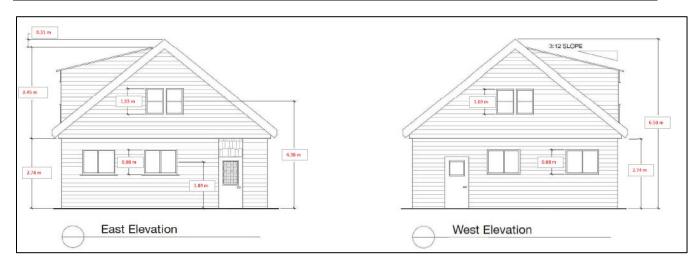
Building elevations. Note that building height for gable roofs is measured from the average distance between the ridge of the roof and eaves.
